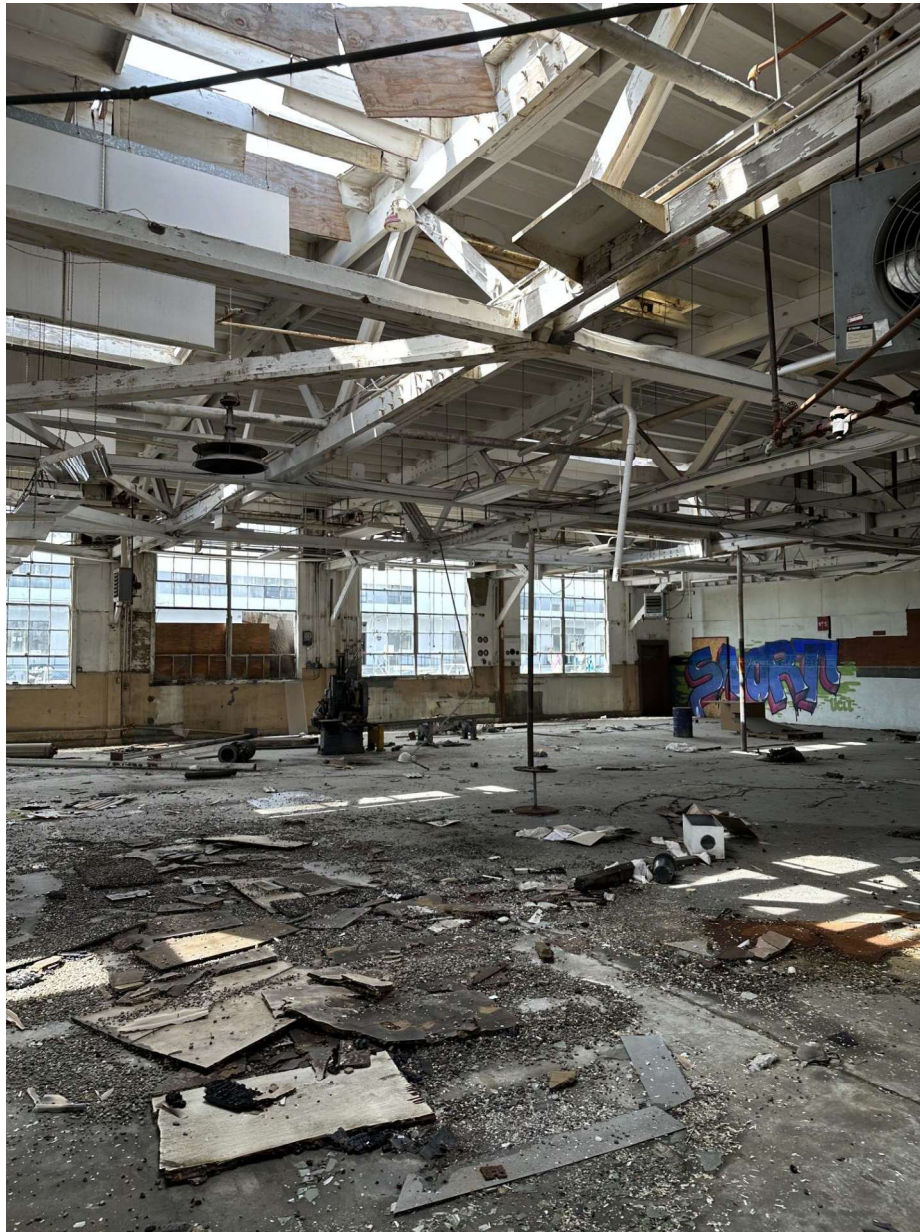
South wing high bay typical structure and damage from firefighting activity; suspected temporary truss shoring columns in view.
